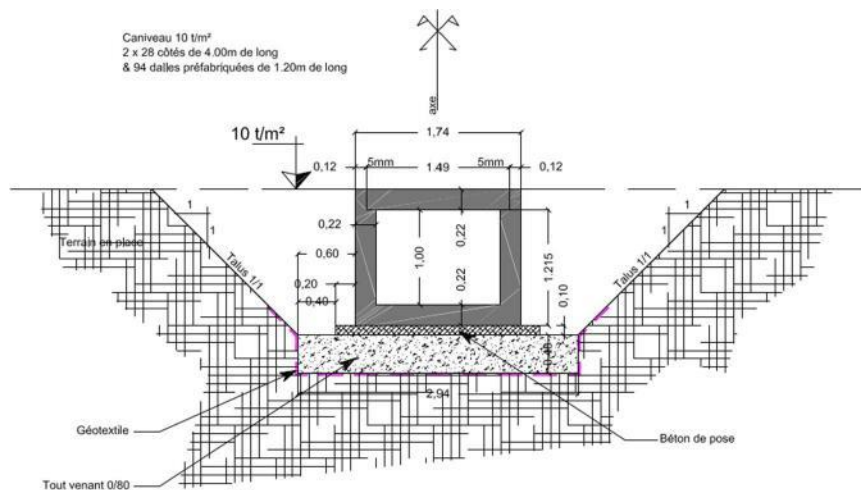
Cross-section of the concrete culvert under the heavy roadway between QR5 and the EMR quays [25].
